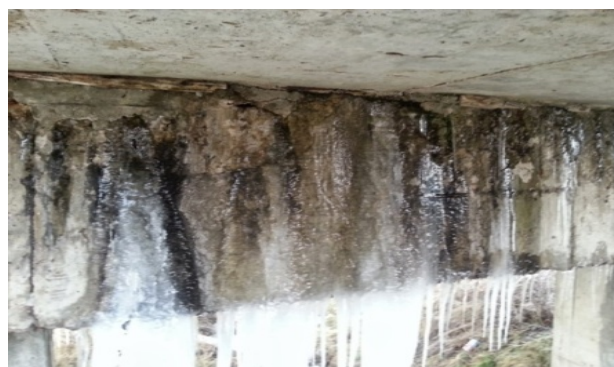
, The damage of pilar holders and canals from freezing and water loss
